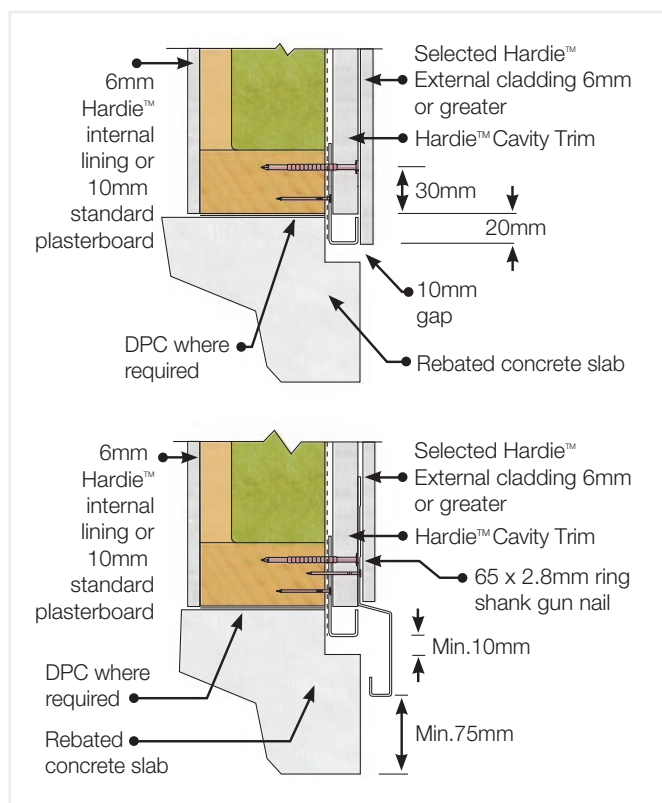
HARDIE™ CAVITY TRIM SLAB EDGE DETAIL
